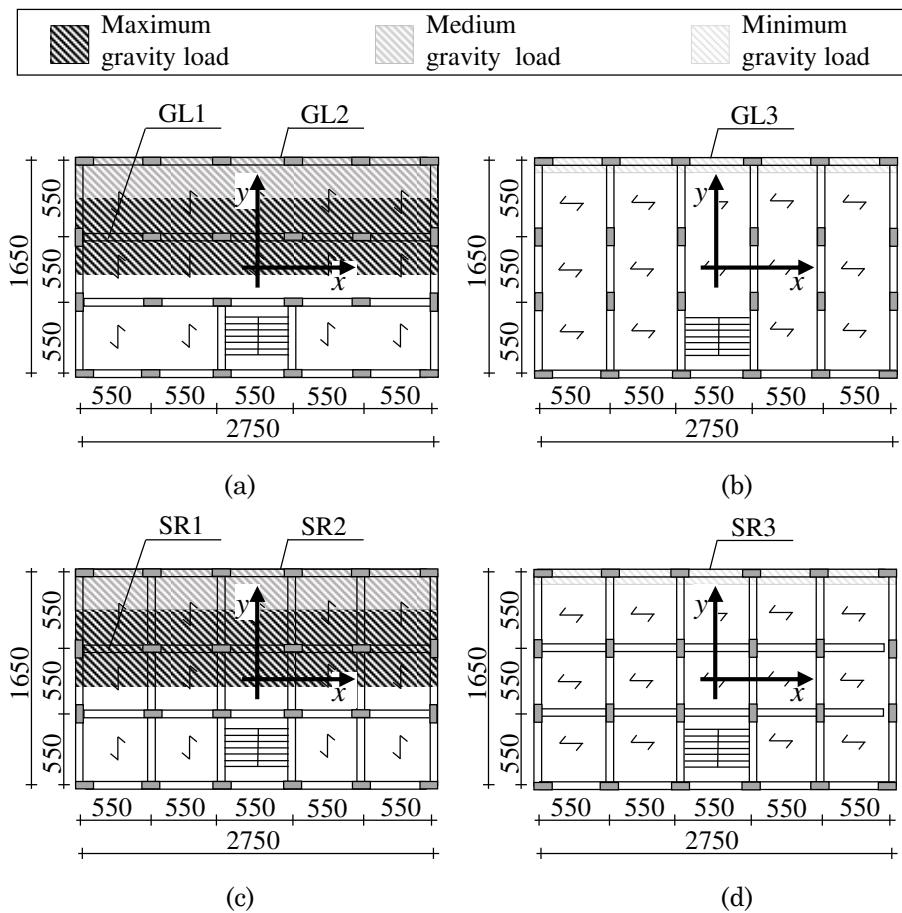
Plan layout of buildings (units in cm): (a) GL building and (c) SR building with deck perpendicular to longitudinal frames; (b) GL building and (d) SR building with deck parallel to longitudinal frames
